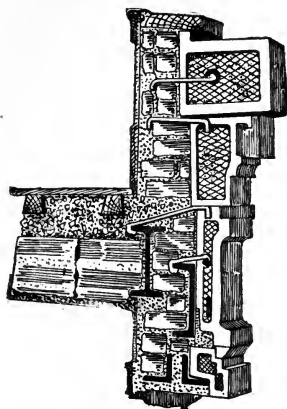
Spandrel Section, Sixteenth Floor. Broadway Chambers, New York.
